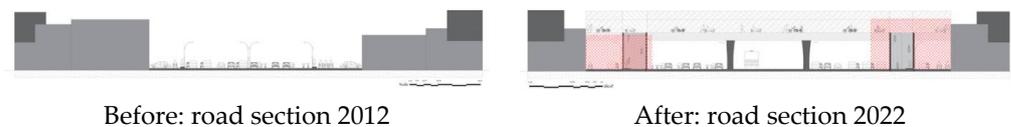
Transformation of a road section at Chungi Amar Sidhu Station, where the demolished building space is highlighted in red color (adapted from [52]).
